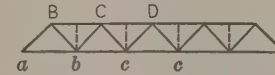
(c). Warren Truss. (See photograph, page 95.)
